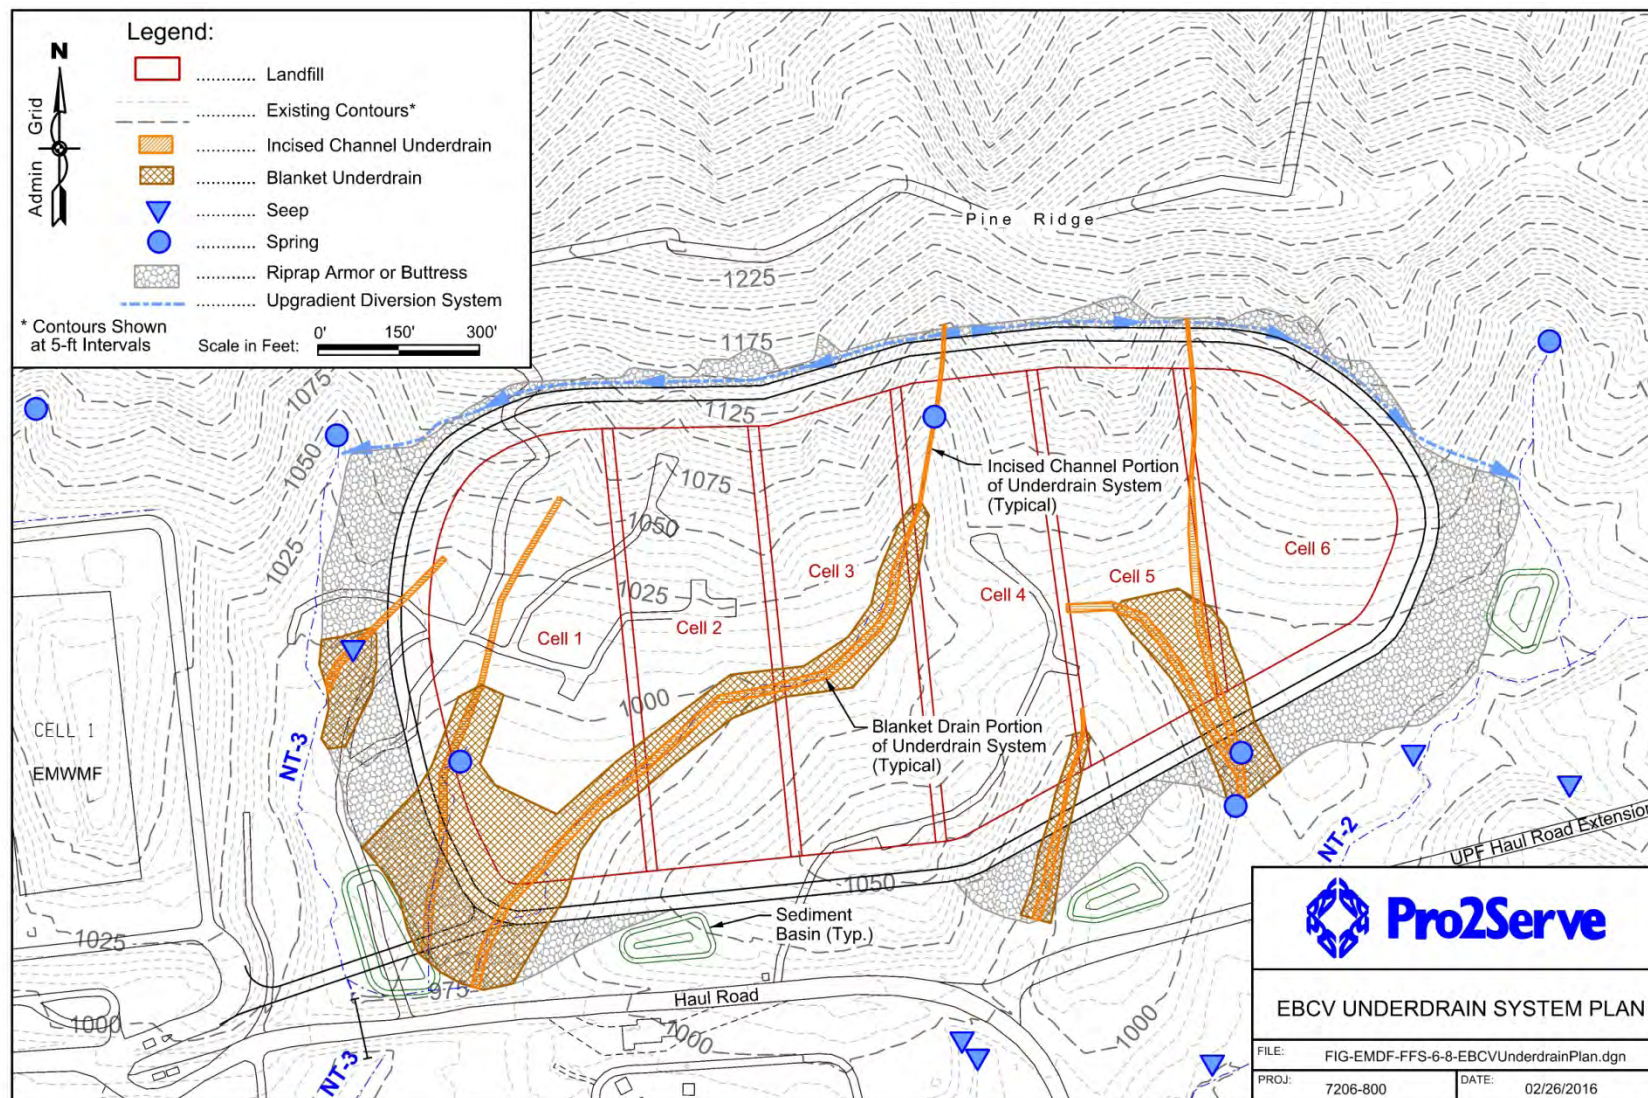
EBCV Site, EMDF Underdrain System Plan
